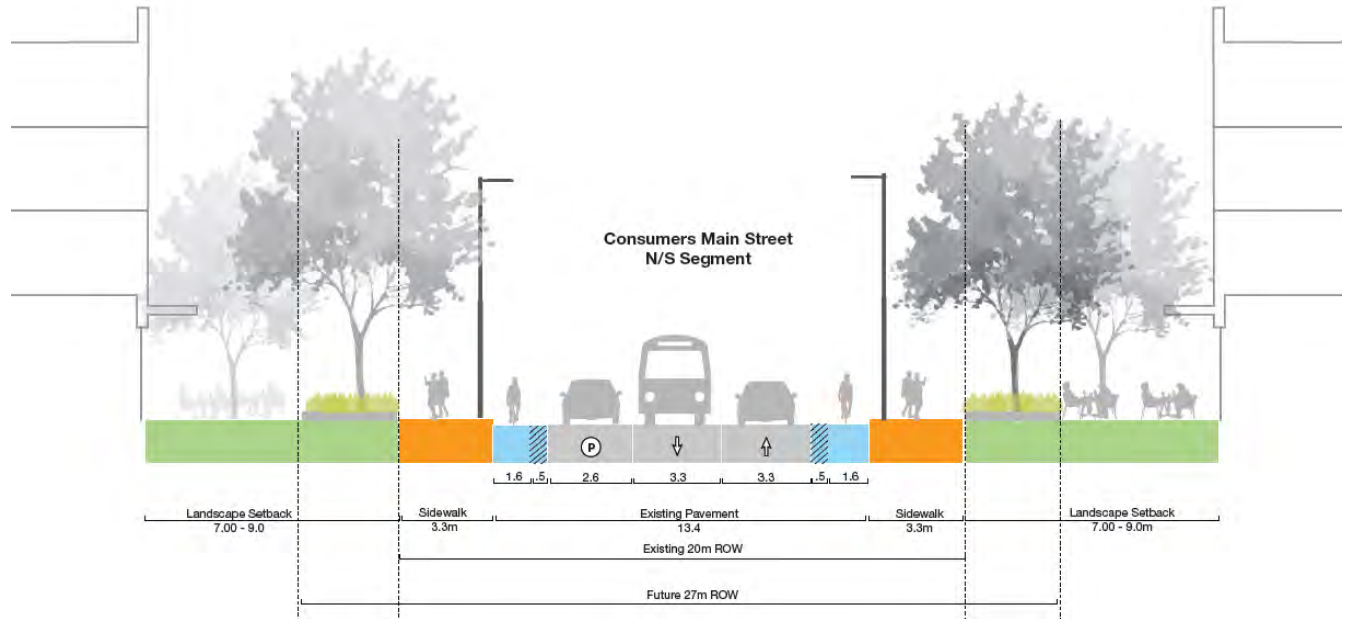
Consumers Road Preferred Cross-Section, North-South Segment
